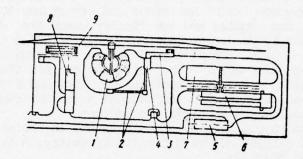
Schematic Plan of a Yard for the Production of Prefabricated Reinforced Concrete Structures and Parts: 1 - storage area for the concrete aggregate; 2 - elevated platform with transporters for feeding the aggregate; 3 storage area for cement; 4 - concrete solution shop; 5 - reinforcement shop; 6 - beds for molding and heat treatment of prefabricated reinforced concrete structures and parts; 7 storage area for the finished product; 8 - boiler; 9 - carbon storage.
